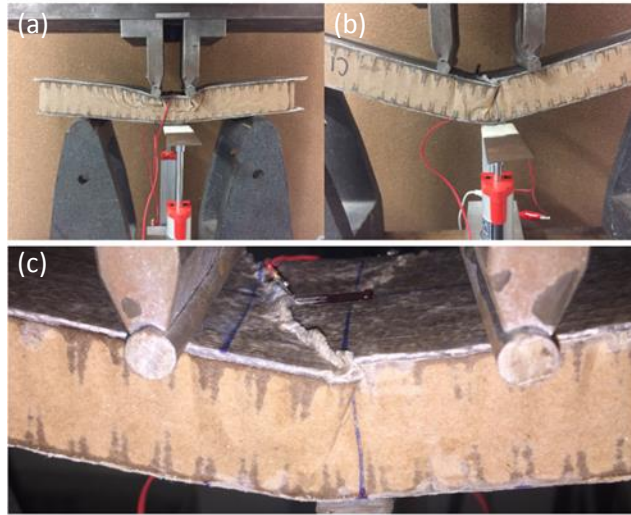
Failure modes: (a) indentation; (b) longitudinal crushing; and (c) detail of top skin crushing.
